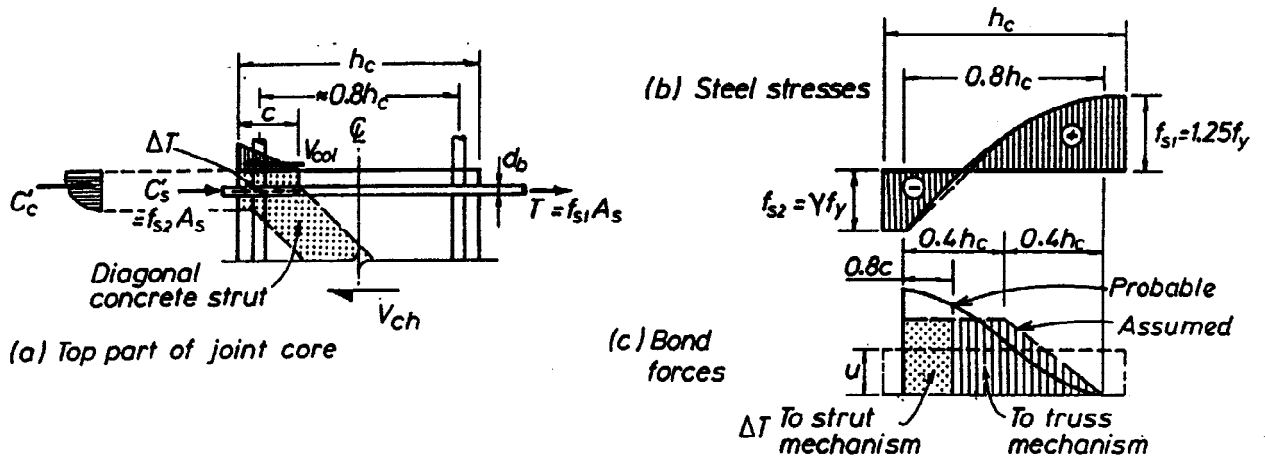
Internal actions associated with the strut and truss mechanisms in an internal beam-column joint.
